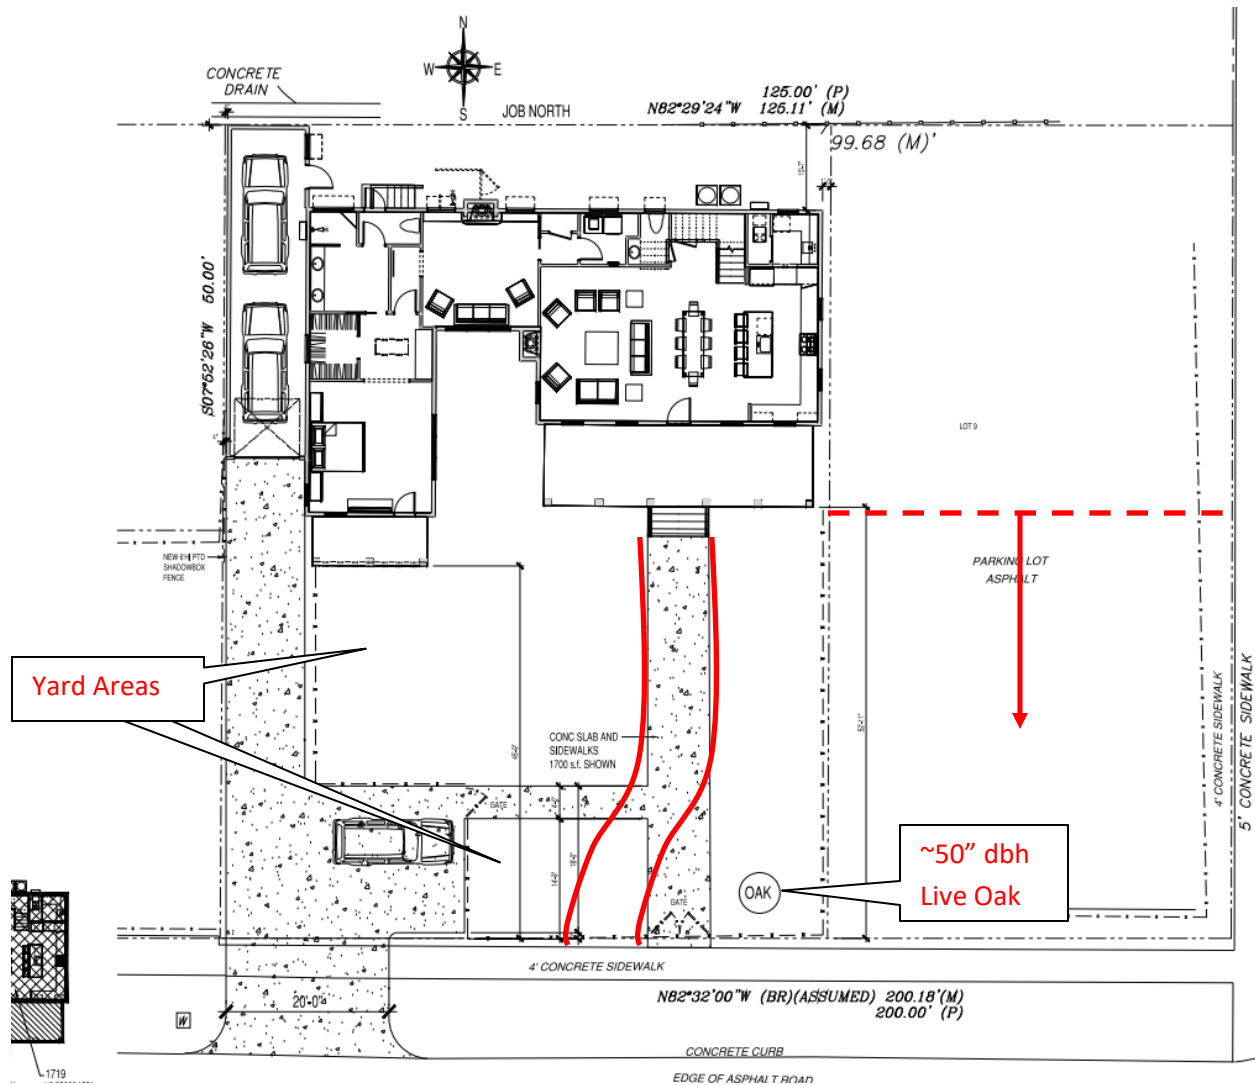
Site Plan for Kemp and Boyer – My understanding is that the asphalt parking lot would be removed from the dotted line to the south which would certainly be beneficial to the tree. As drawn, there would only be about 2 feet between the tree and the sidewalk according to the scale on the plan. I recommend that the sidewalk be curved to give the tree and root system of the tree more room.
